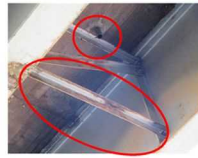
Corrosion occurred under the outlet of a drain pipe
